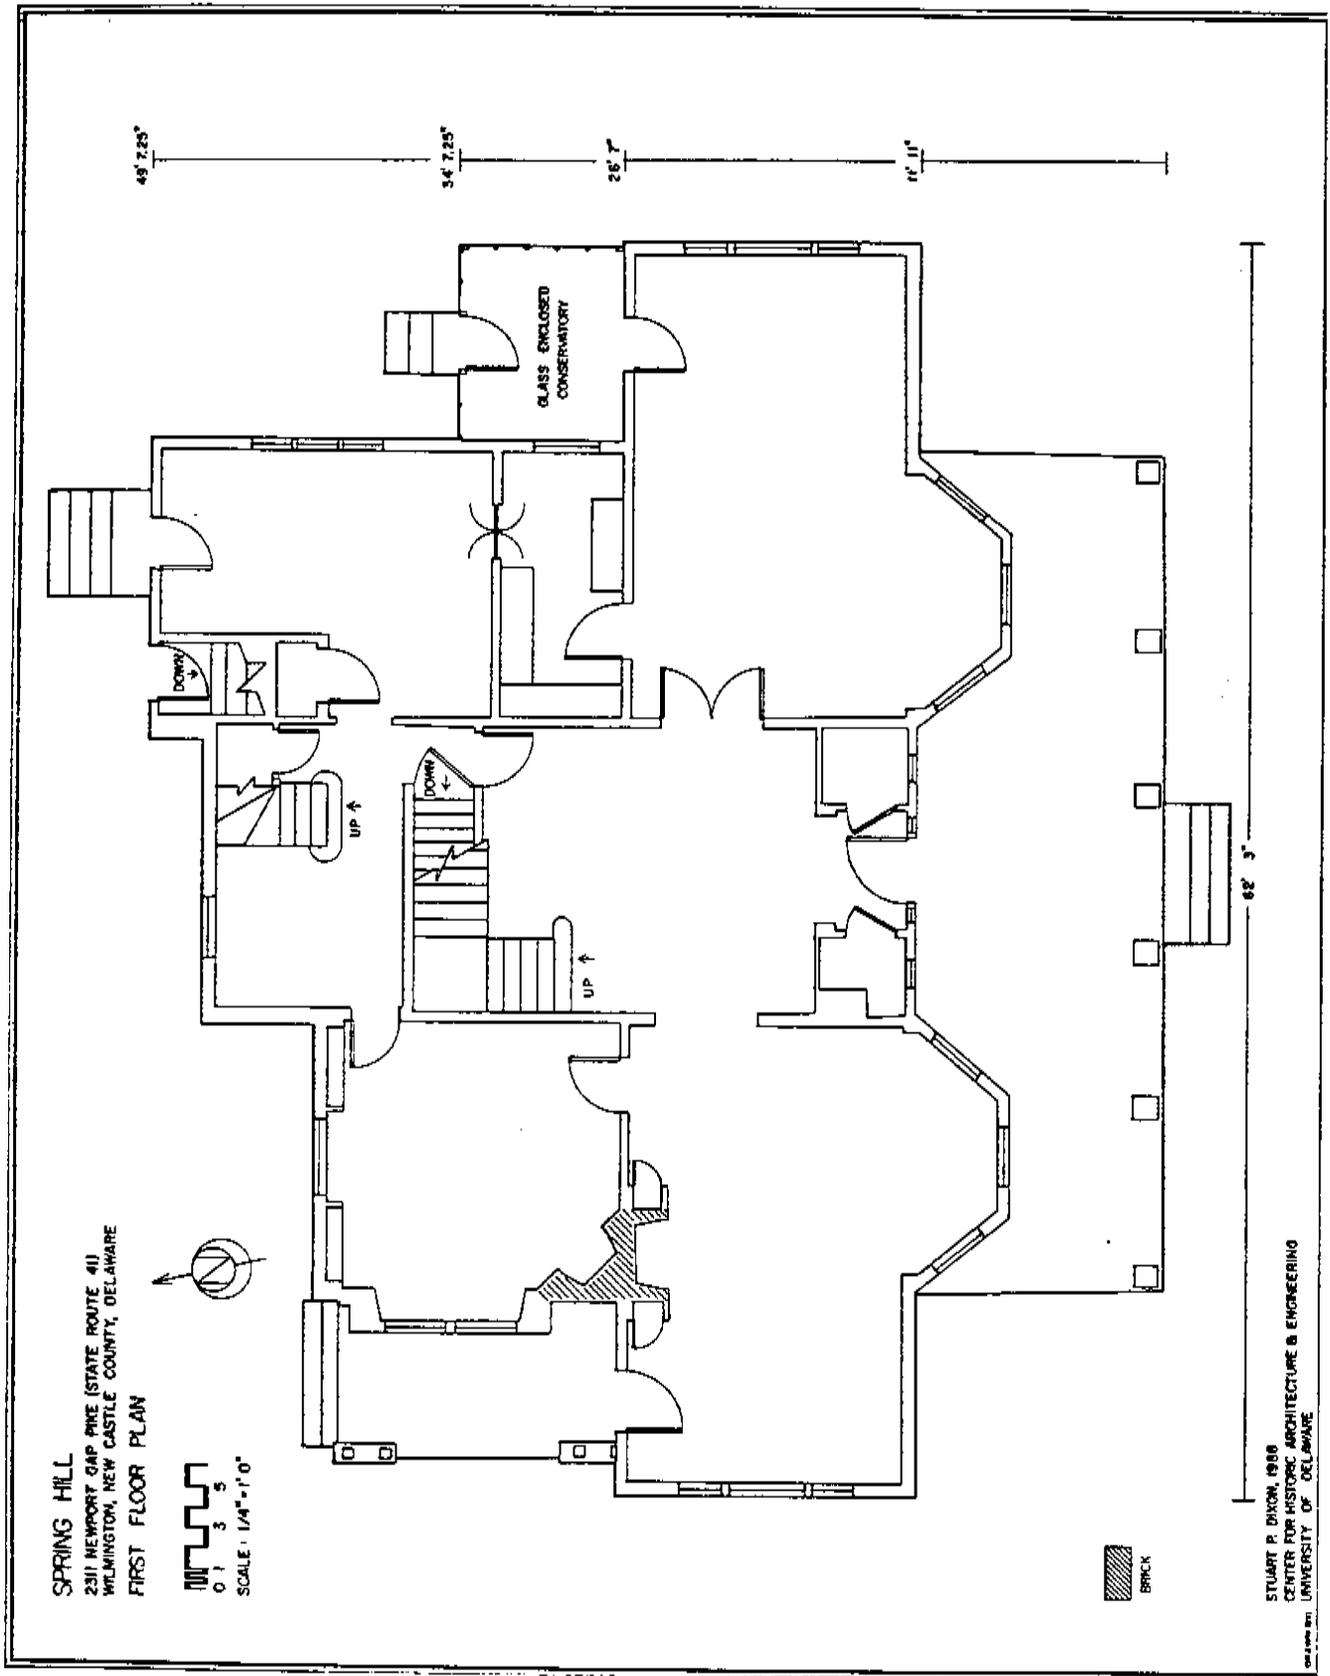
Floor Plan of Spring Hill (Drawn by Stuart Dixon)
